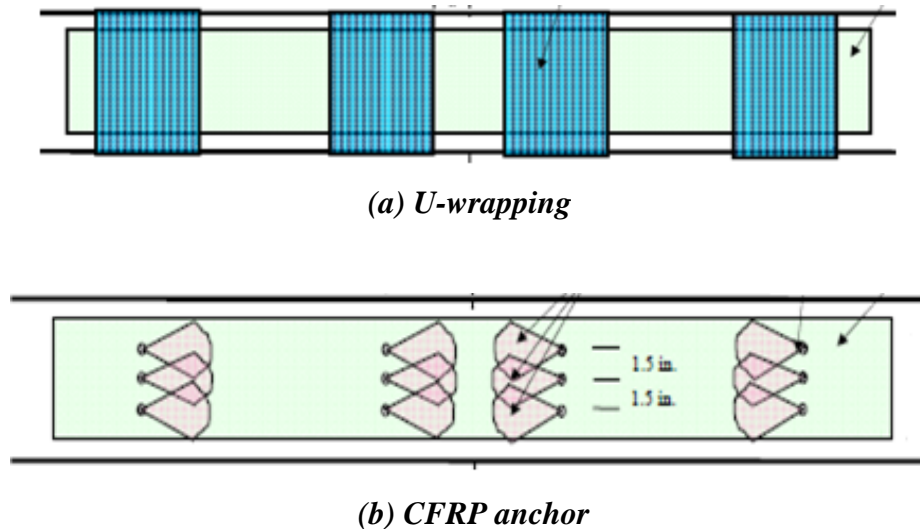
CFRP application with anchorage systems (Kim, 2008)
